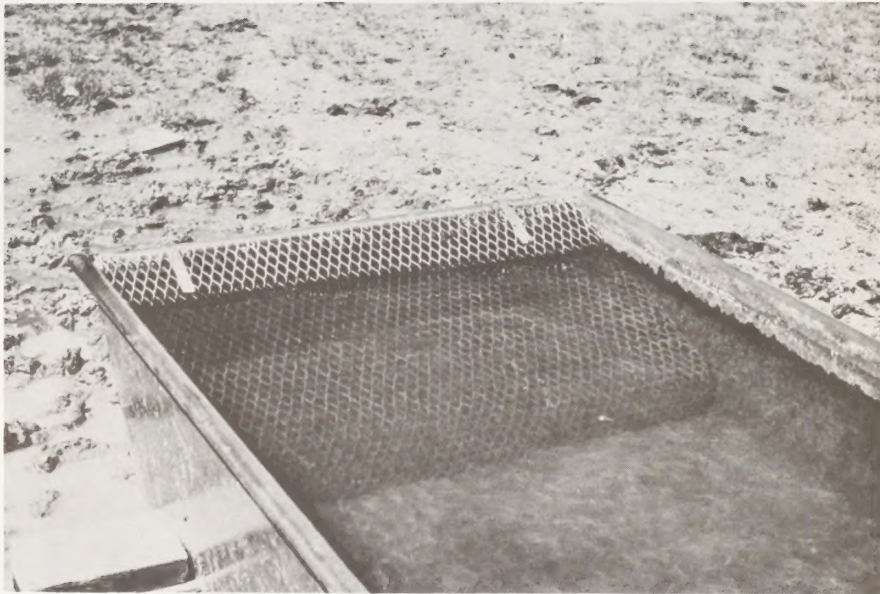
TYPICAL SMALL ANIMAL ESCAPE RAMP.
